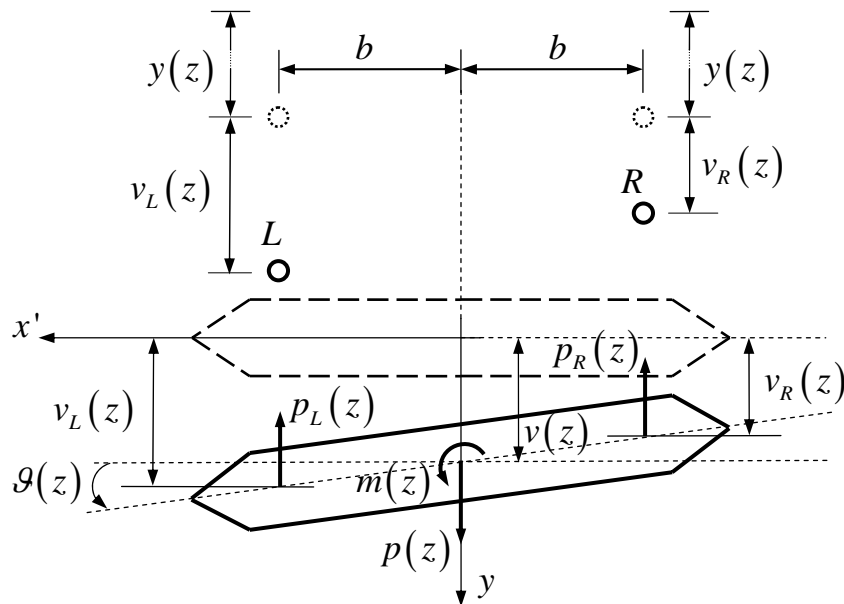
Flexural-torsional deformation of a suspension bridge deck section.
